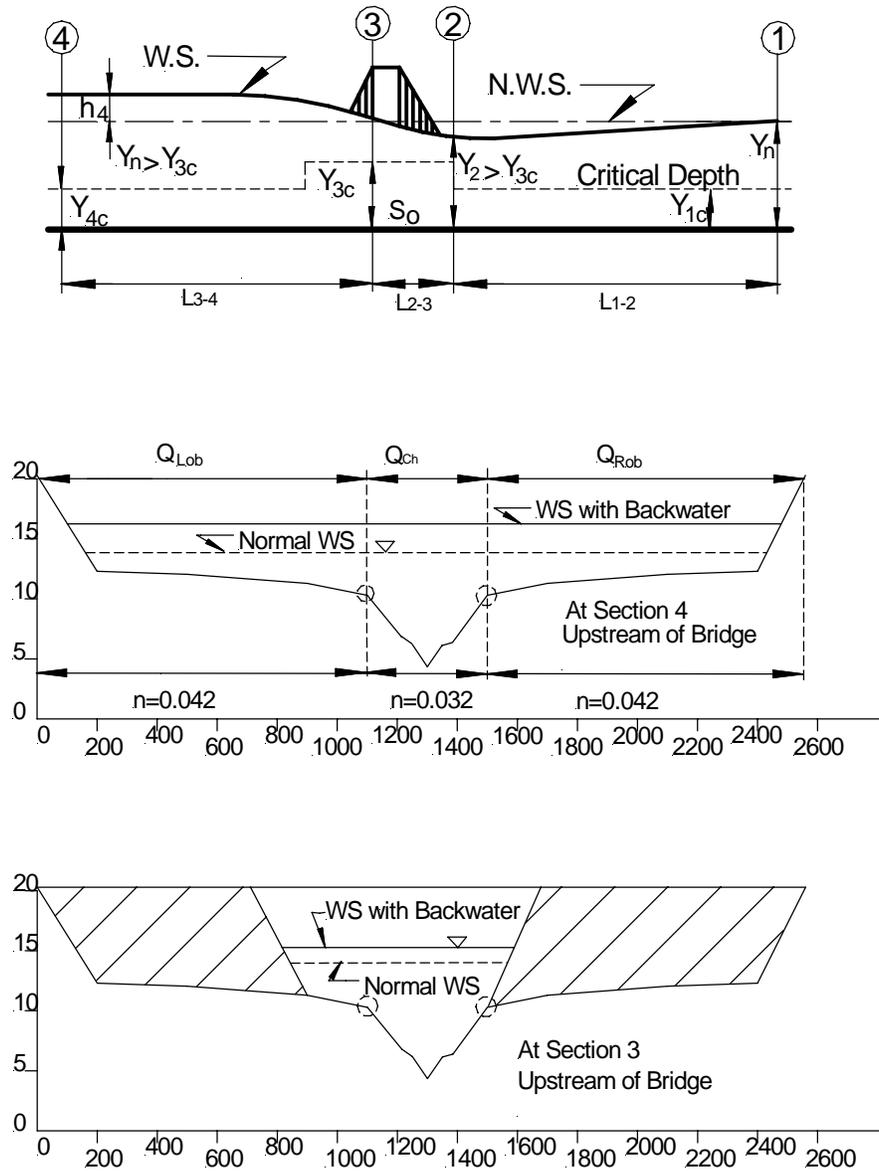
B-1 Normal Crossing: Spillthrough Abutments
